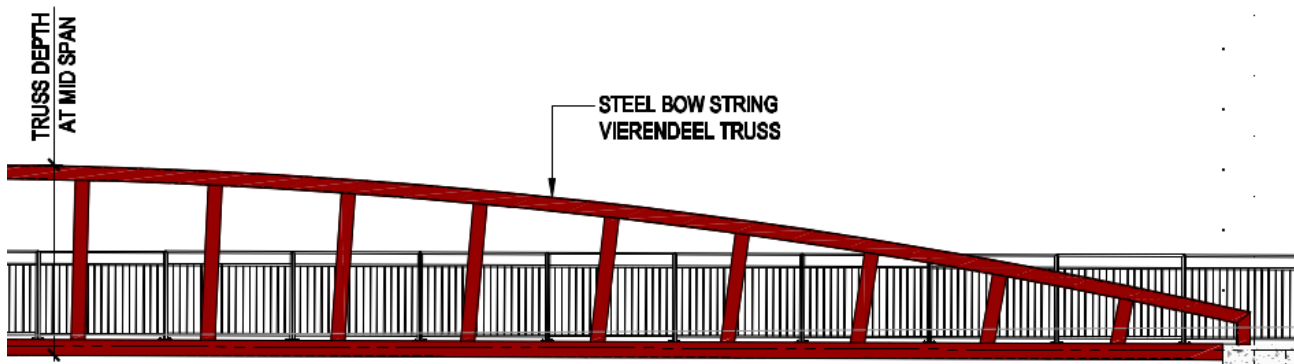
Elevation of Proposed Active Travel Bridge Superstructure (Midspan to Abutment)
